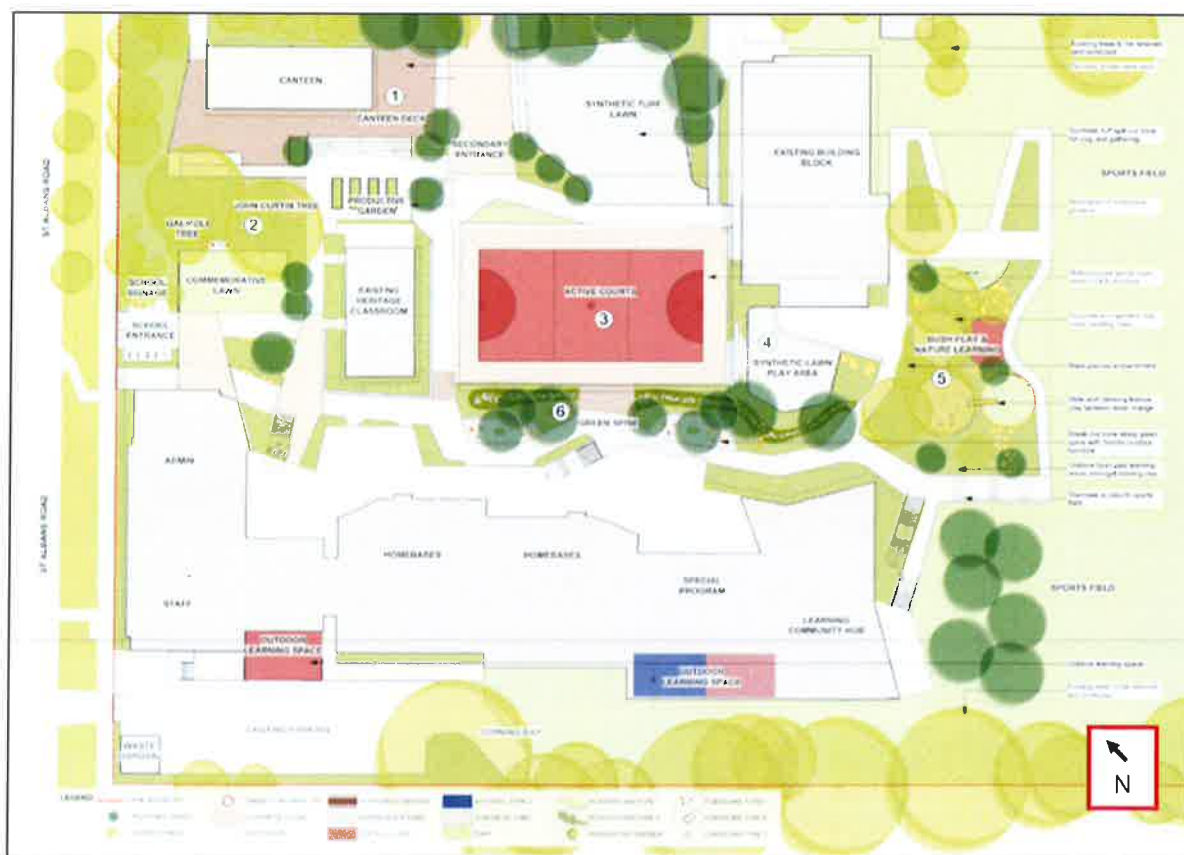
| Approved Landscape Plan (Base Source: SSD-8740 Application 2018)
